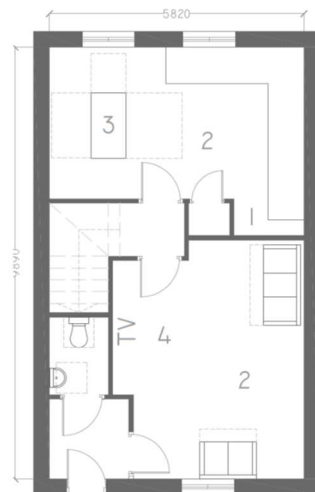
Layout previously submitted as part of a planning application for a housing development, 2 bedrooms 4 people, 2 storey, GIFA 66 m<sup>2</sup>.
